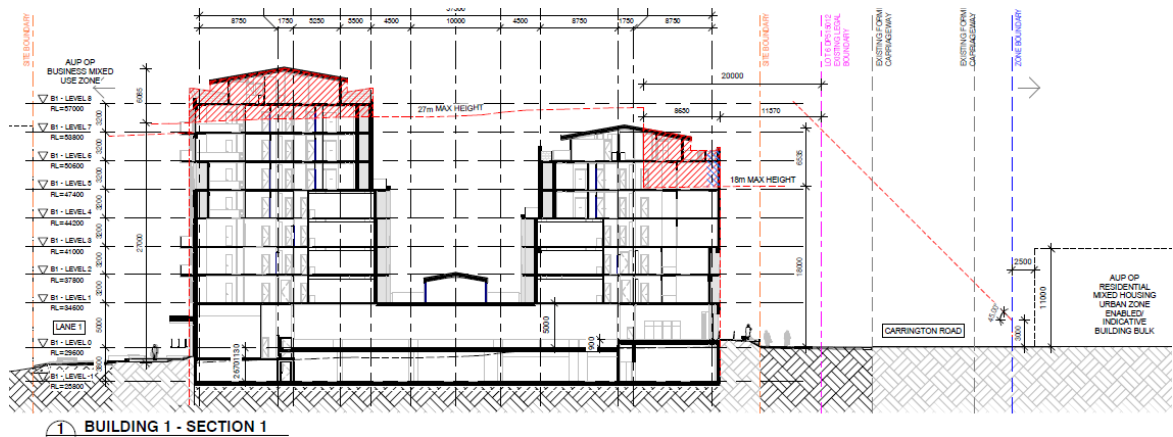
Section through Maungāroho RC1 Building 1 showing overall building height and infringements (red hatched) of the Wairaka Precinct operative 18m and 27m height areas. Image source: Maungāroho RC1 architectural drawings.
